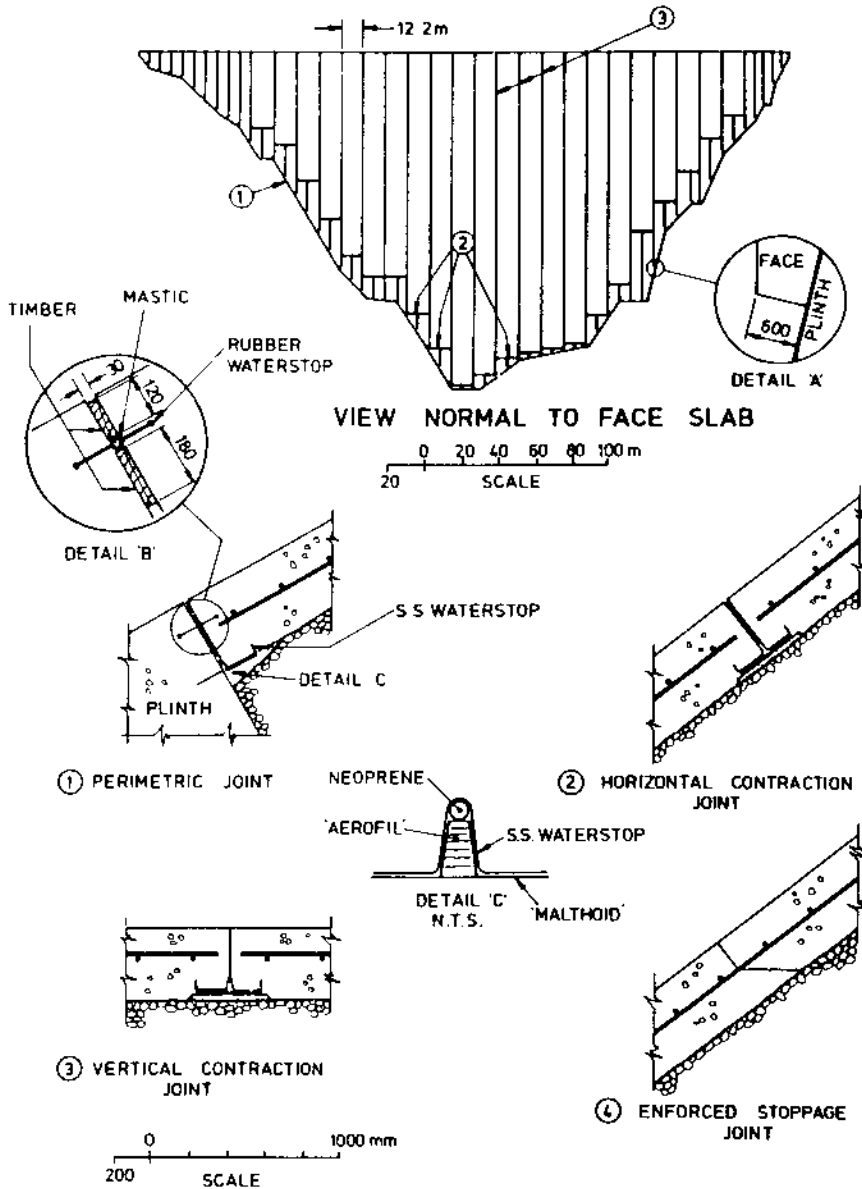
Joint layout and details for Lower Pieman Dam (Fitzpatrick et al. 1985).
